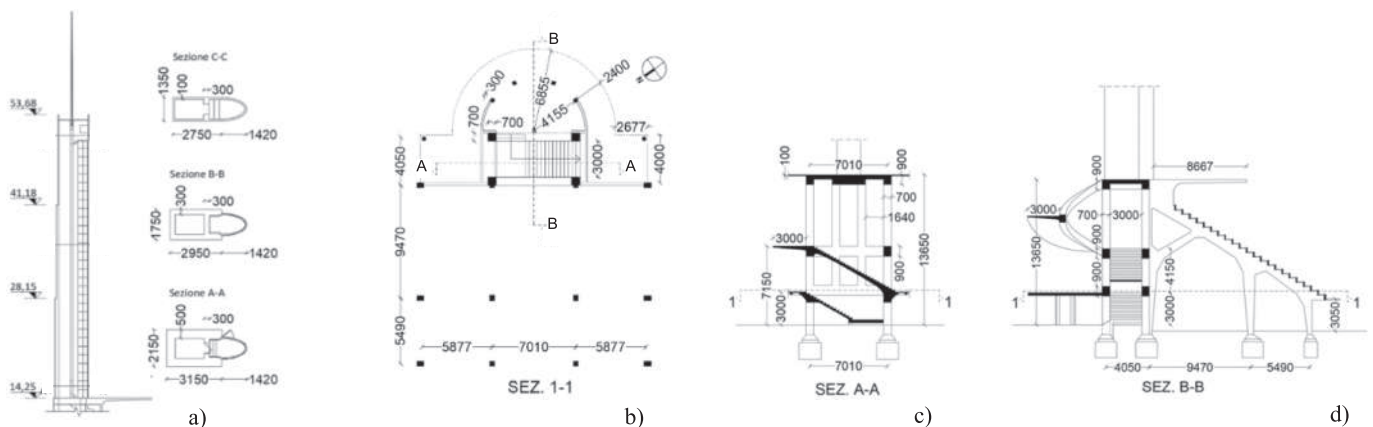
Lateral view and cross sections of Maratona Tower (a, b), and vertical sections of block 10 at the base of the Tower (c, d) – dimensions in meters (Tower elevation) and millimeters (sections).
